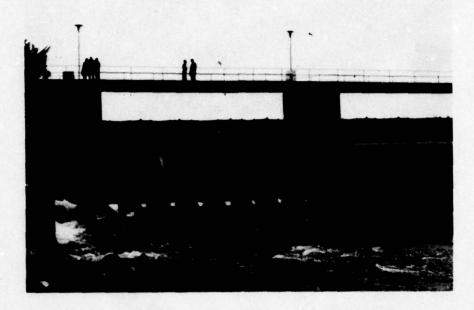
View of North End of Spillway Looking Upstream Showing Outlet Channel.
